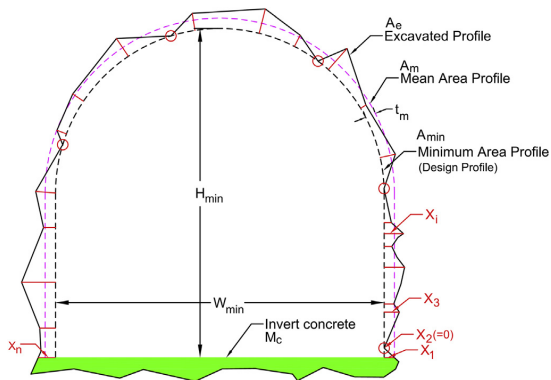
Roughness of unlined or shotcrete-lined tunnel with invert concrete.
